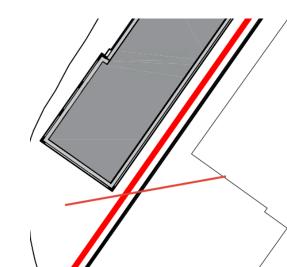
45 Degree Light Angle Test from rear first floor window of adjacent dwelling
